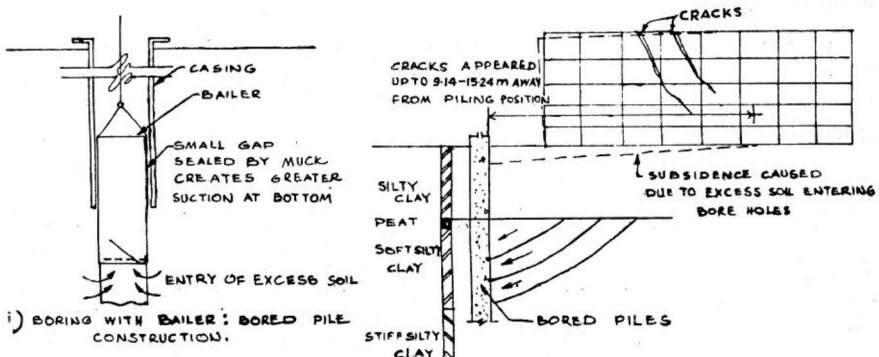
Hazards due to entry of excess soil during boring for construction of bored piles.
